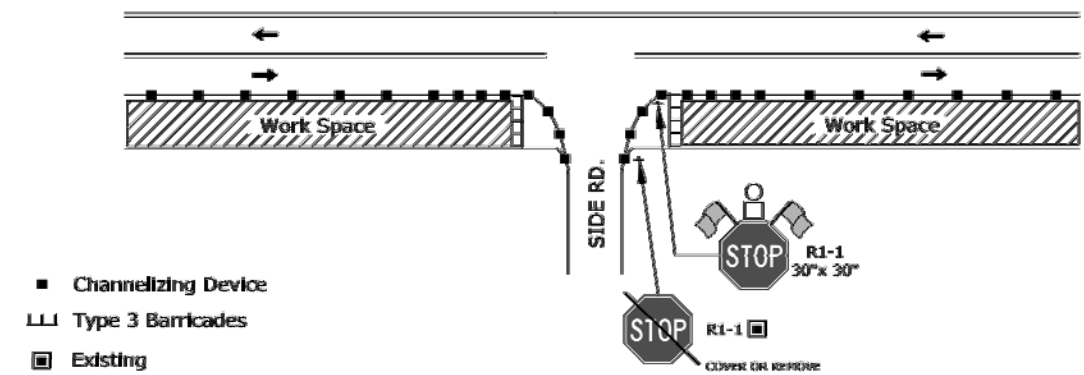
SIDE ROAD OR ENTRANCE OPEN THROUGH WORK AREA
